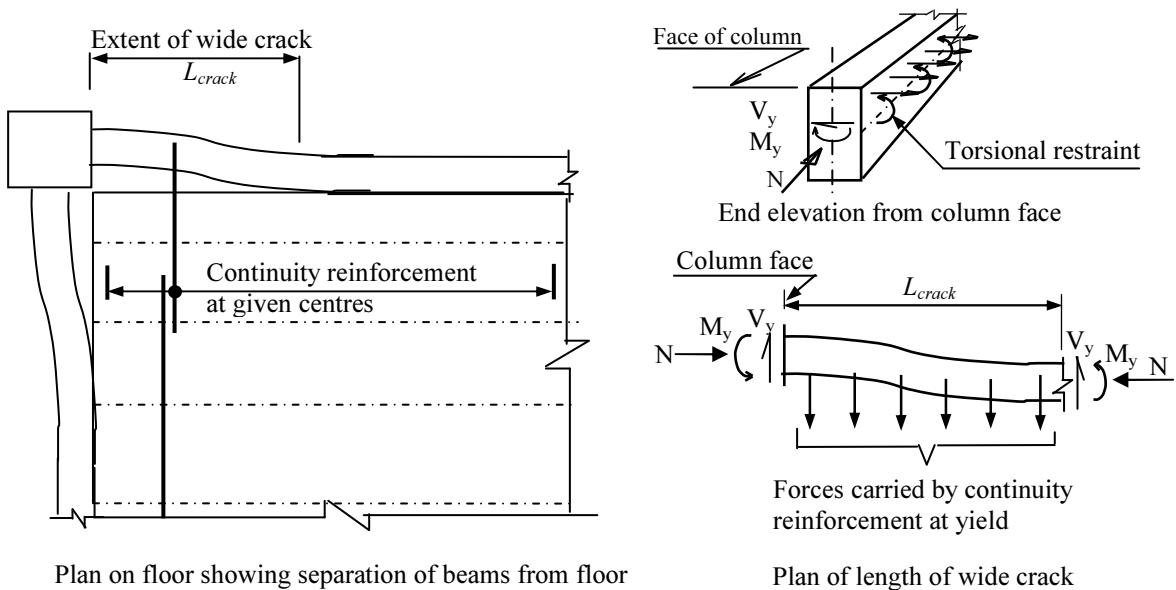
Location of cracks and strut and tie forces in a floor slab
